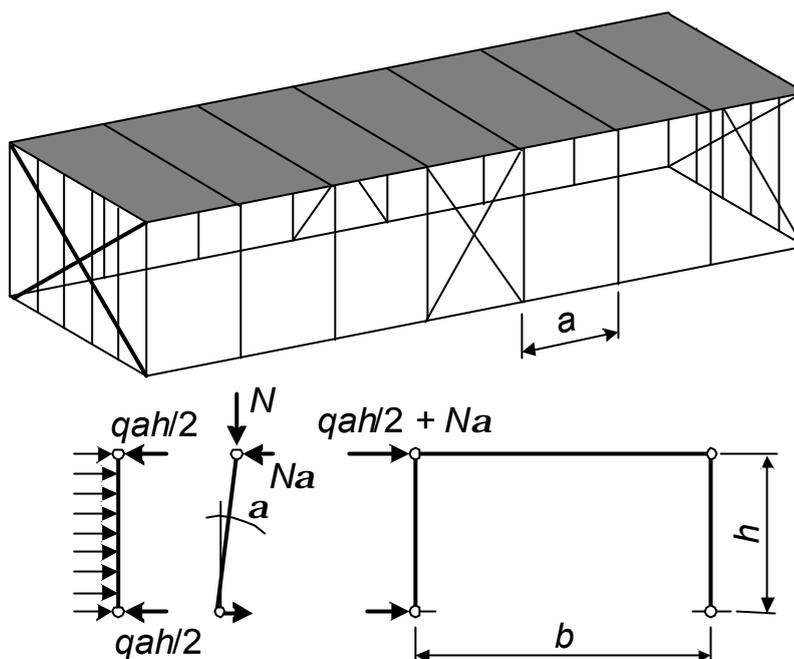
Open plan building stabilised by wind bracing in the walls and diaphragm of trapezoidal sheeting in the roof (Höglund, 2002).
